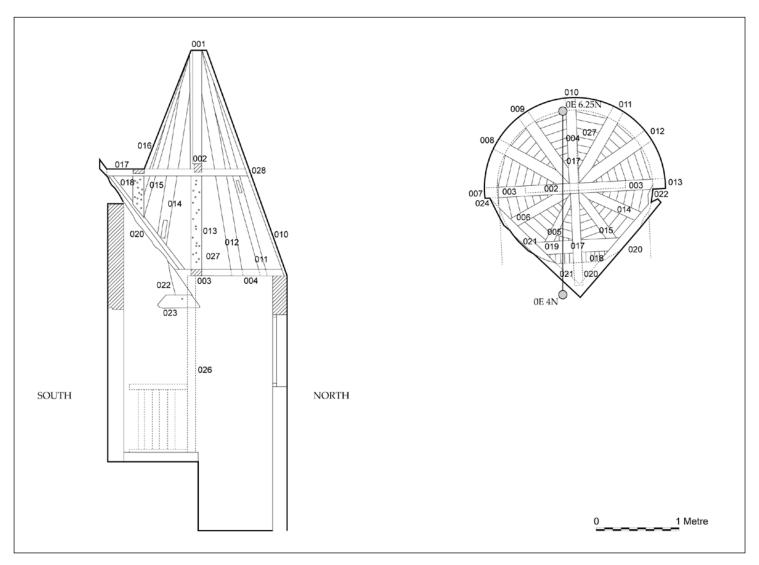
E Facing Elevation & Underside Plan of Central Turret
